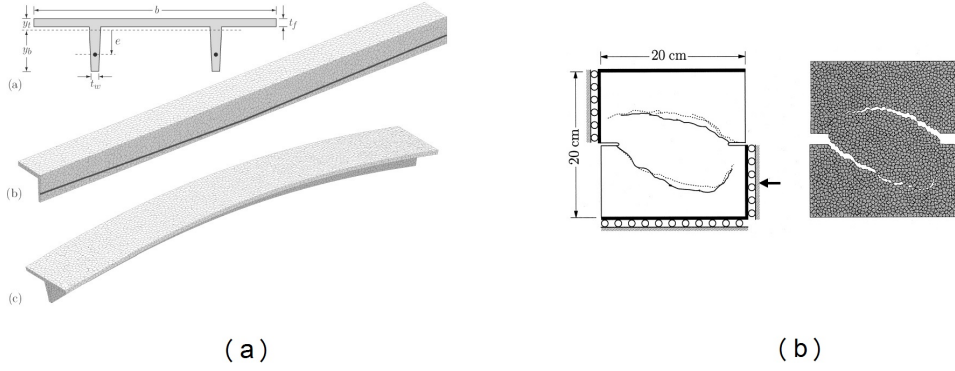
Two examples of modeled structures: (a) prestressed girder beam, (b) DEN specimen (from Yip and Bolander [87])
